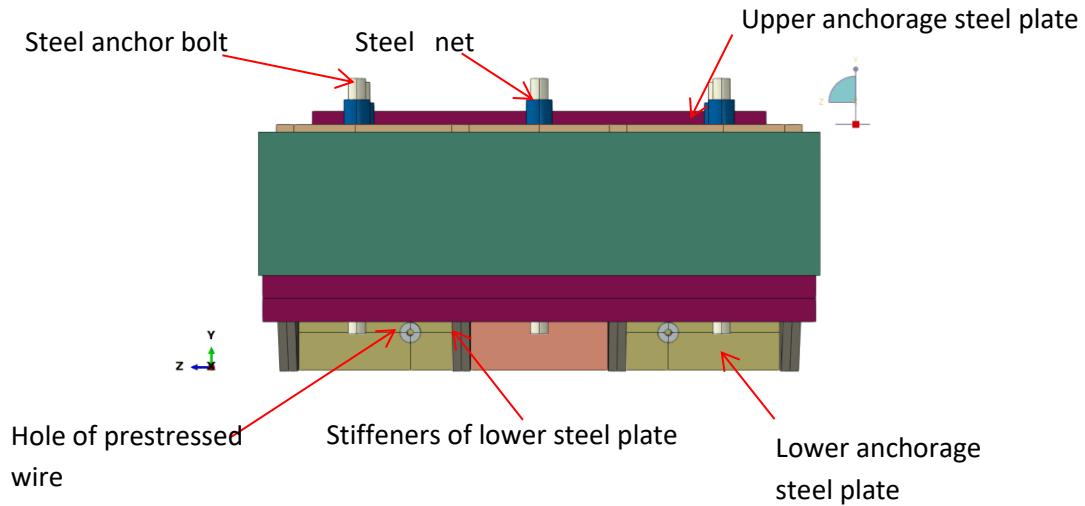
Side view in upper and lower anchorage stiffener steel plates.
